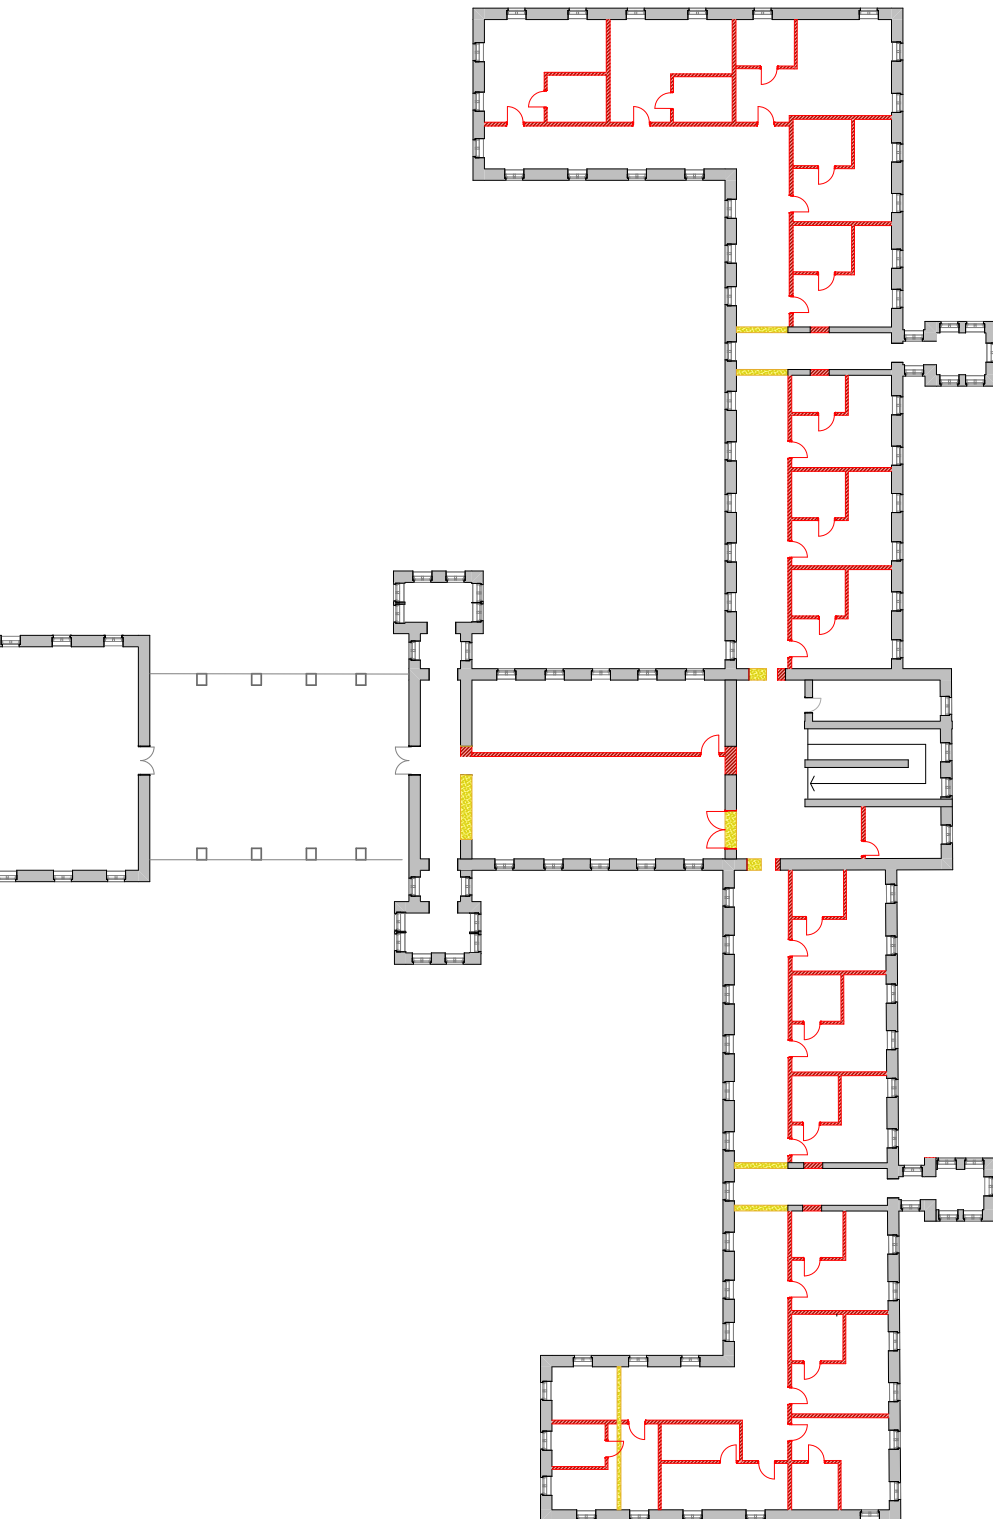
First floor plan of the Morselli Pavilion demolition and construction.
